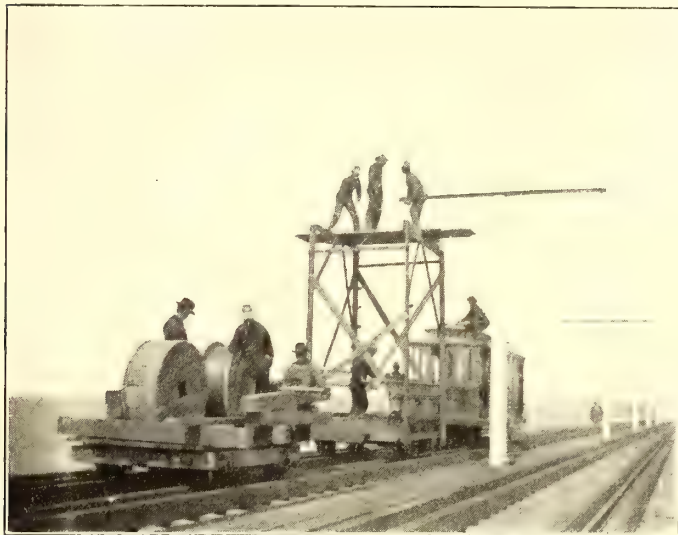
STRINGING TROLLEY WIRE ON PIER
